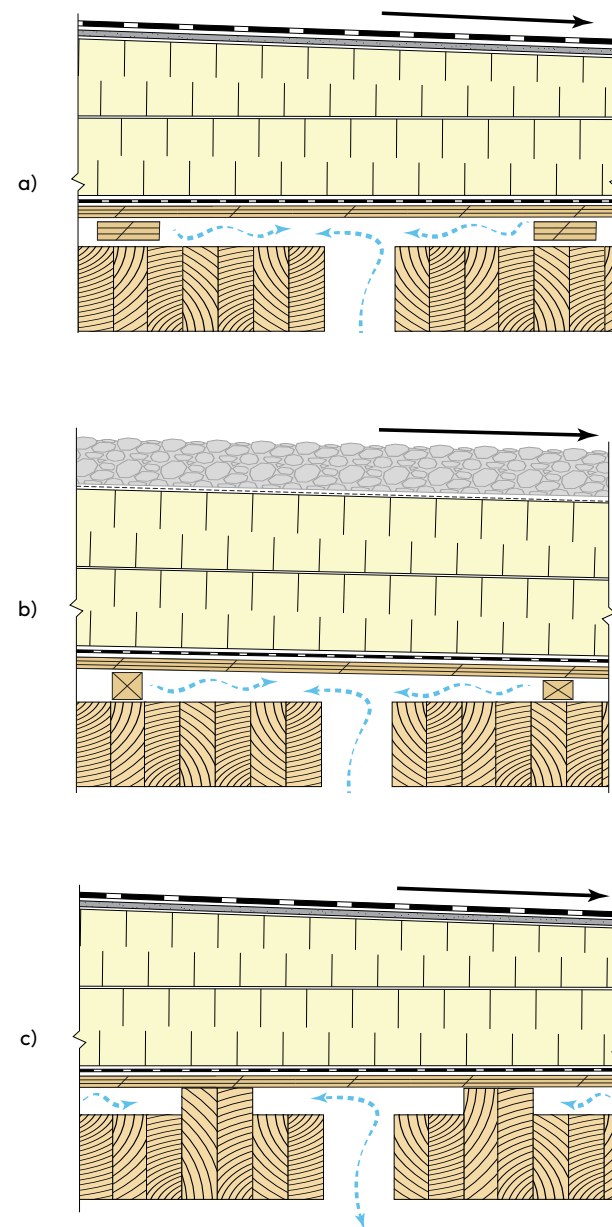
Vented roof assembly with a) flat battens across a mass timber panel, b) tapered strapping with sloped over-framing over a mass timber panel, and c) staggered or variable-height laminations of an NLT or DLT panel. Ventilation pathways to the interior are shown with arrows.
